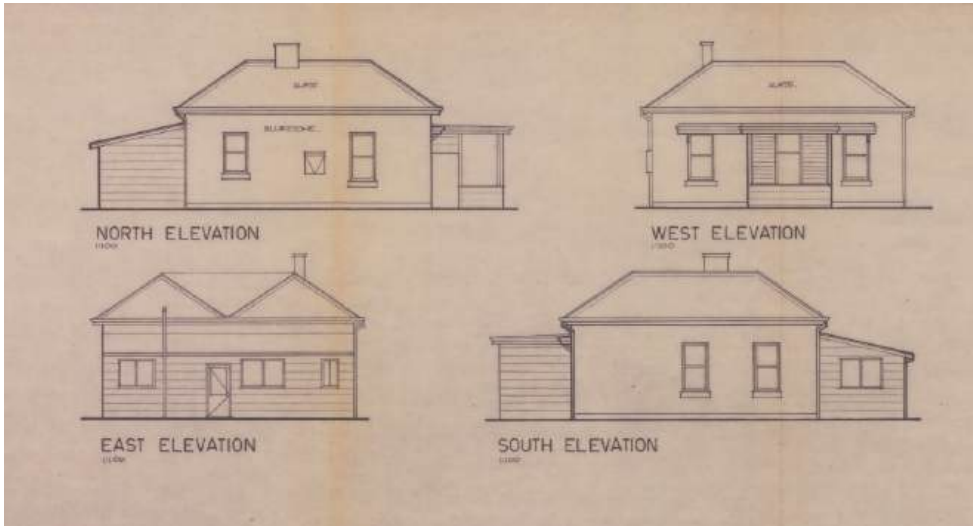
Architectural drawings showing existing conditions in 1987, prior to construction of new verandah (Source: Ballarat City Council)
